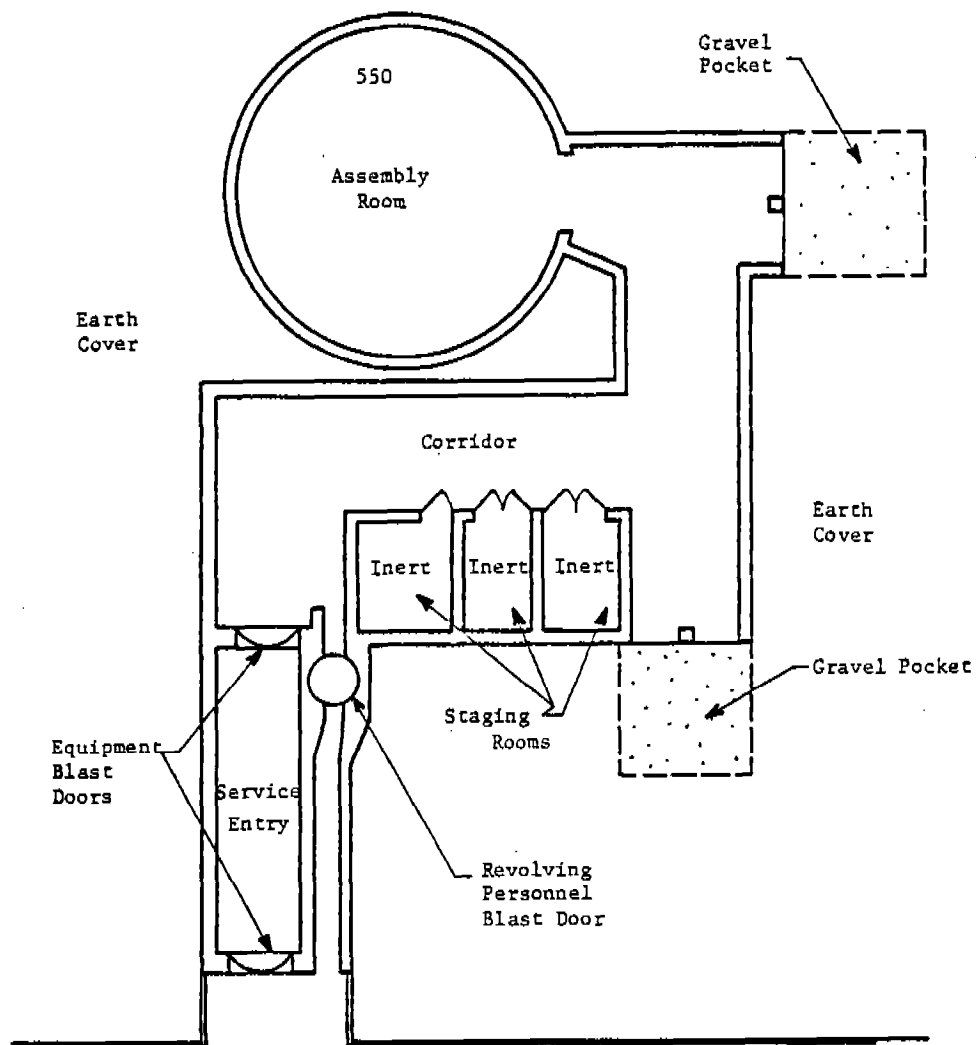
Plan View of Building 12-44, Cell 1, Showing Blast Doors and Corridor
